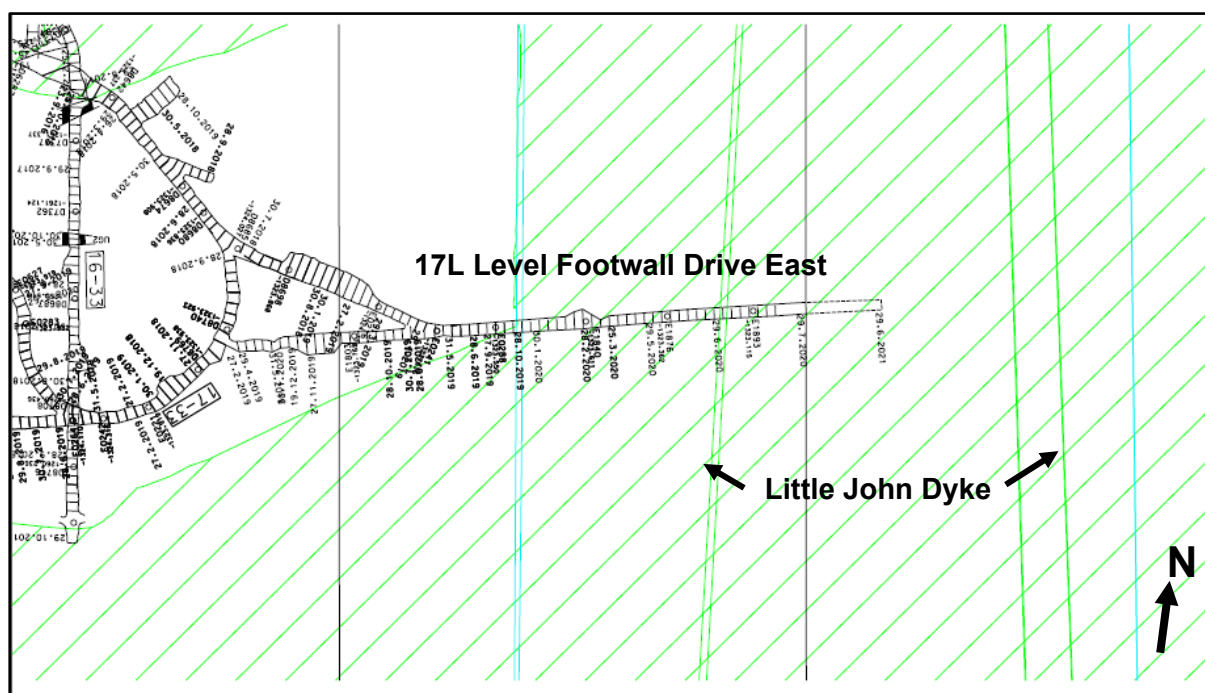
Plan depicting 17 level East foot wall drive passing through Little John Dyke
